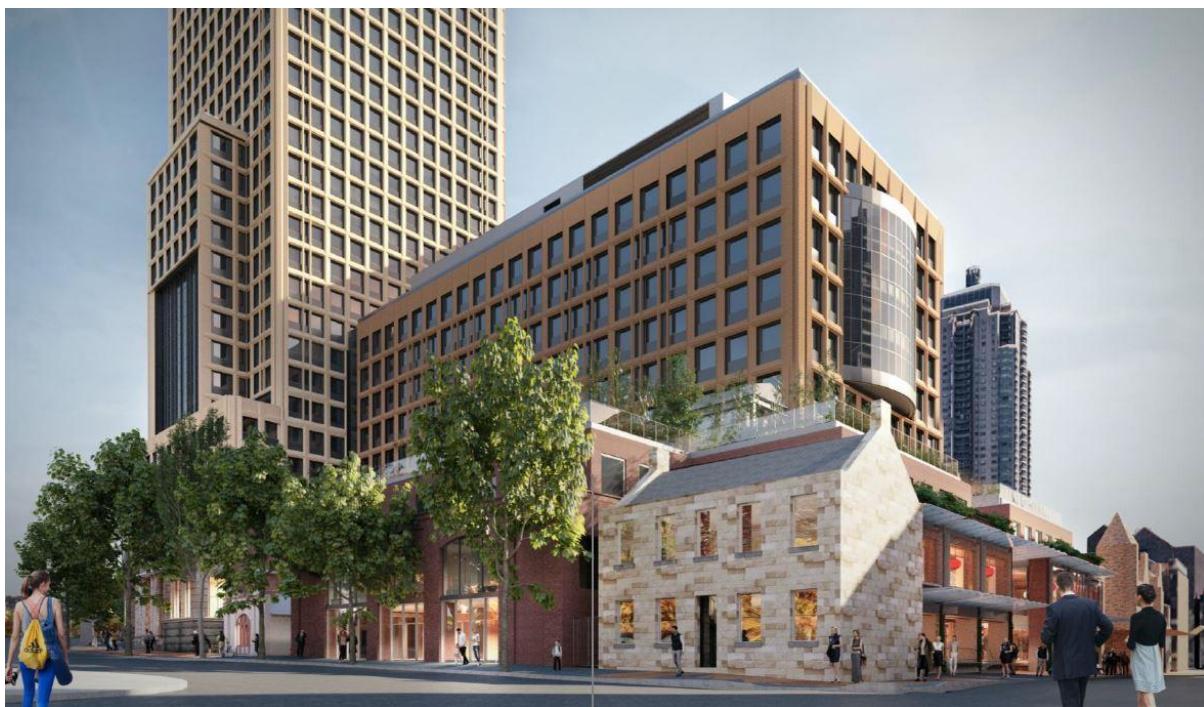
Proposal image: corner of Pitt Street and Hay Street
